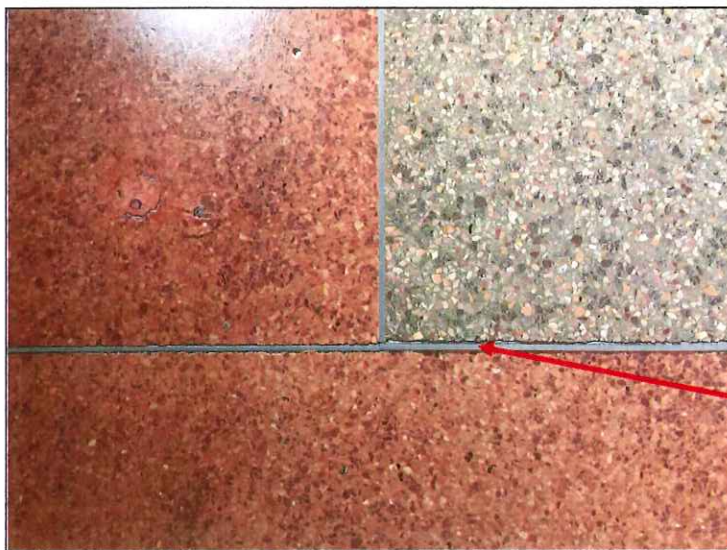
Existing floor conditions - Terrazzo damage and movement surrounding zinc strip (Waisler, 2016)
